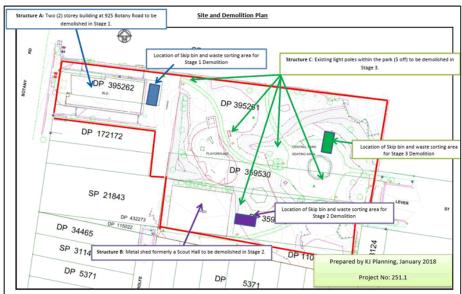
Site and Demolition Plan (Source: KJ Planning, January 2018)
